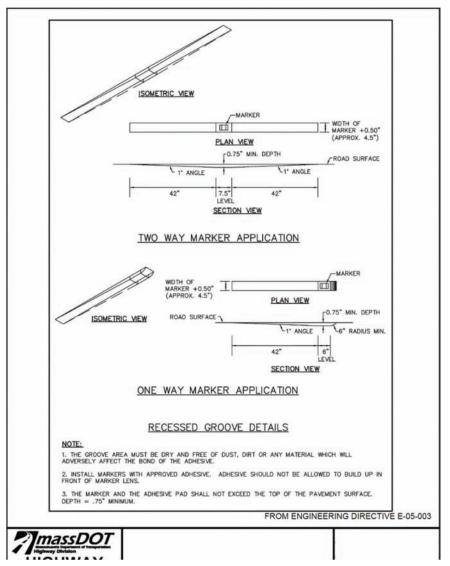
Construction detail—groove for slotted pavement marker on asphalt pavement (personal communication, B. Lang, MassDOT, May 29, 2020).
